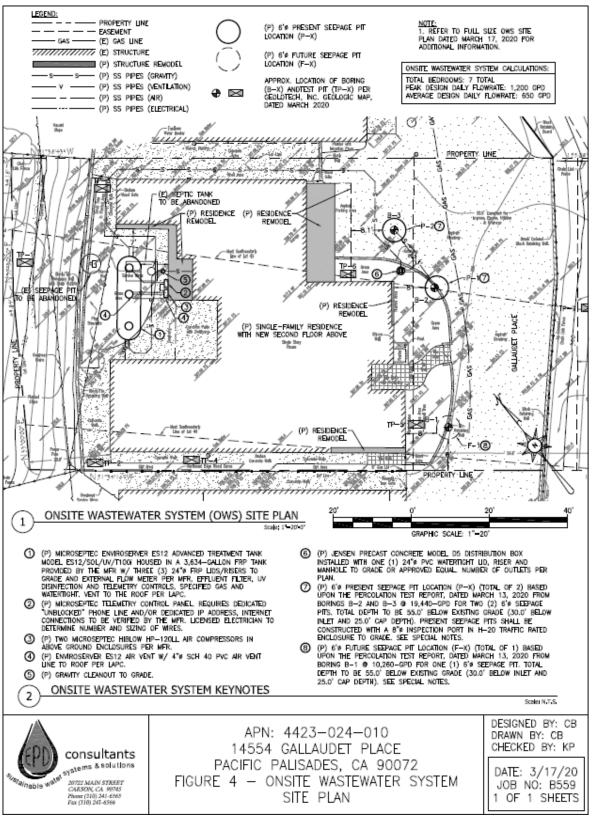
Site Plan of the Single-Family Residence and Advanced Onsite Wastewater Treatment System
